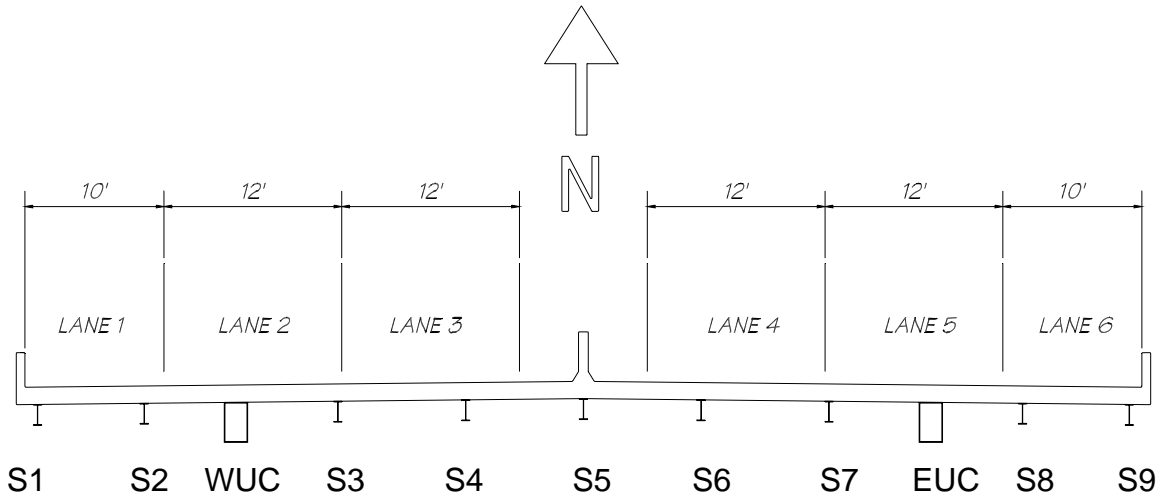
Deck cross-section and lane demarcation (Looking North)
